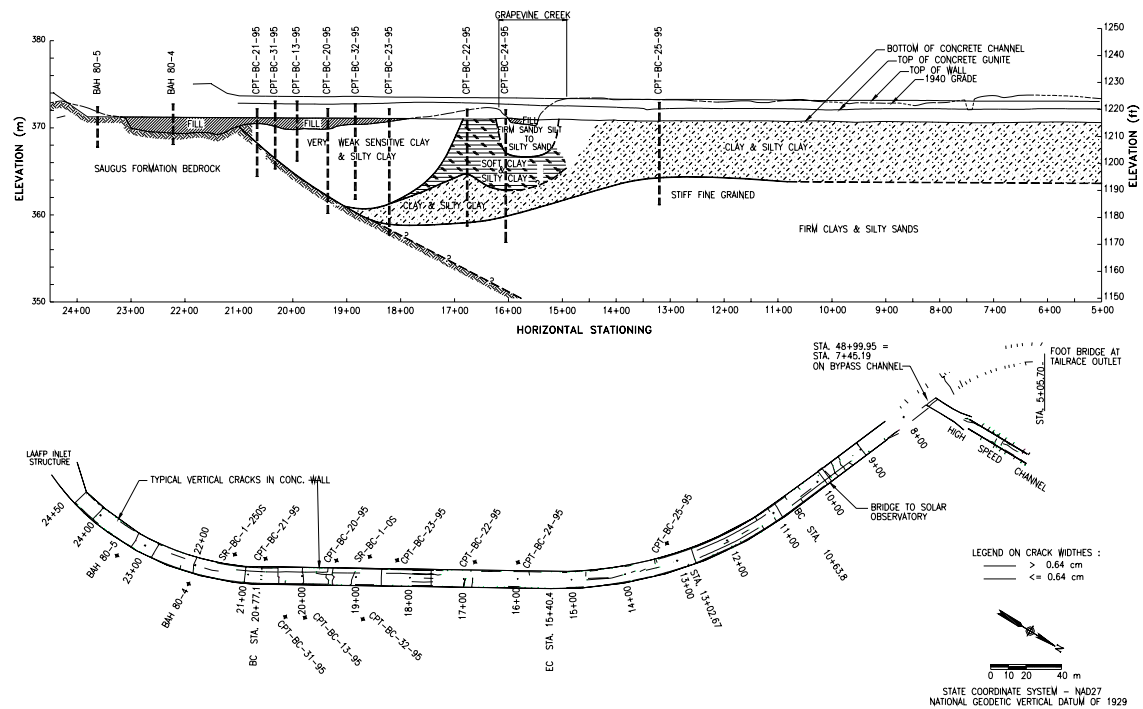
Bypass Channel plan and profile showing crack locations, CPT locations, and interpreted subsurface soil conditions.
